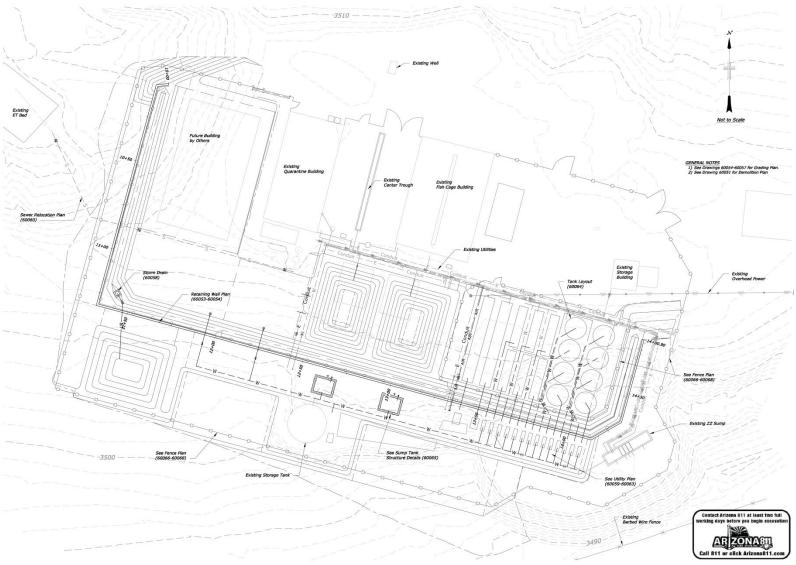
Construction Schematics. Note: the above plans may not fully represent actual construction layout as adjustments to the plans were needed during construction activities (e.g. current tank layout is different from the above).
